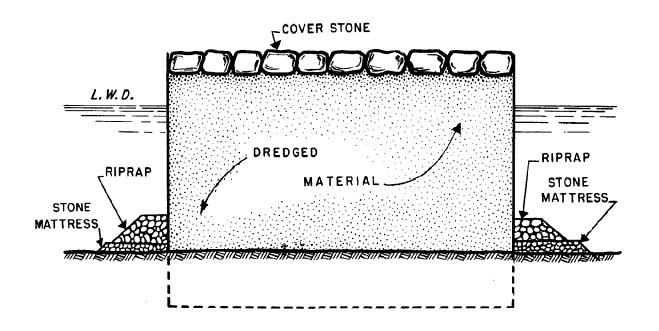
Typical Cellular Steel Sheet Pile Breakwater
